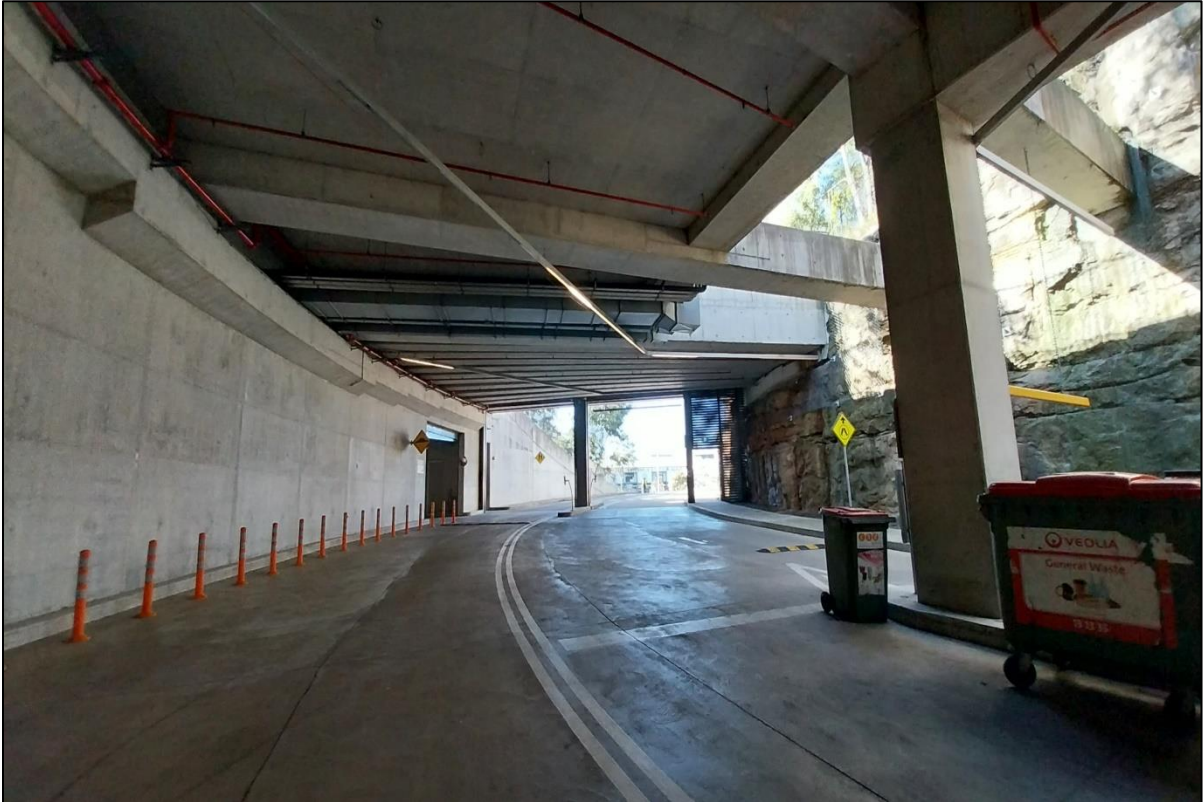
Subject area 1) - Site interior, northern extent, adjacent rock wall, excavated section of concrete, top of surfaces only to former asbestos containing soil.
